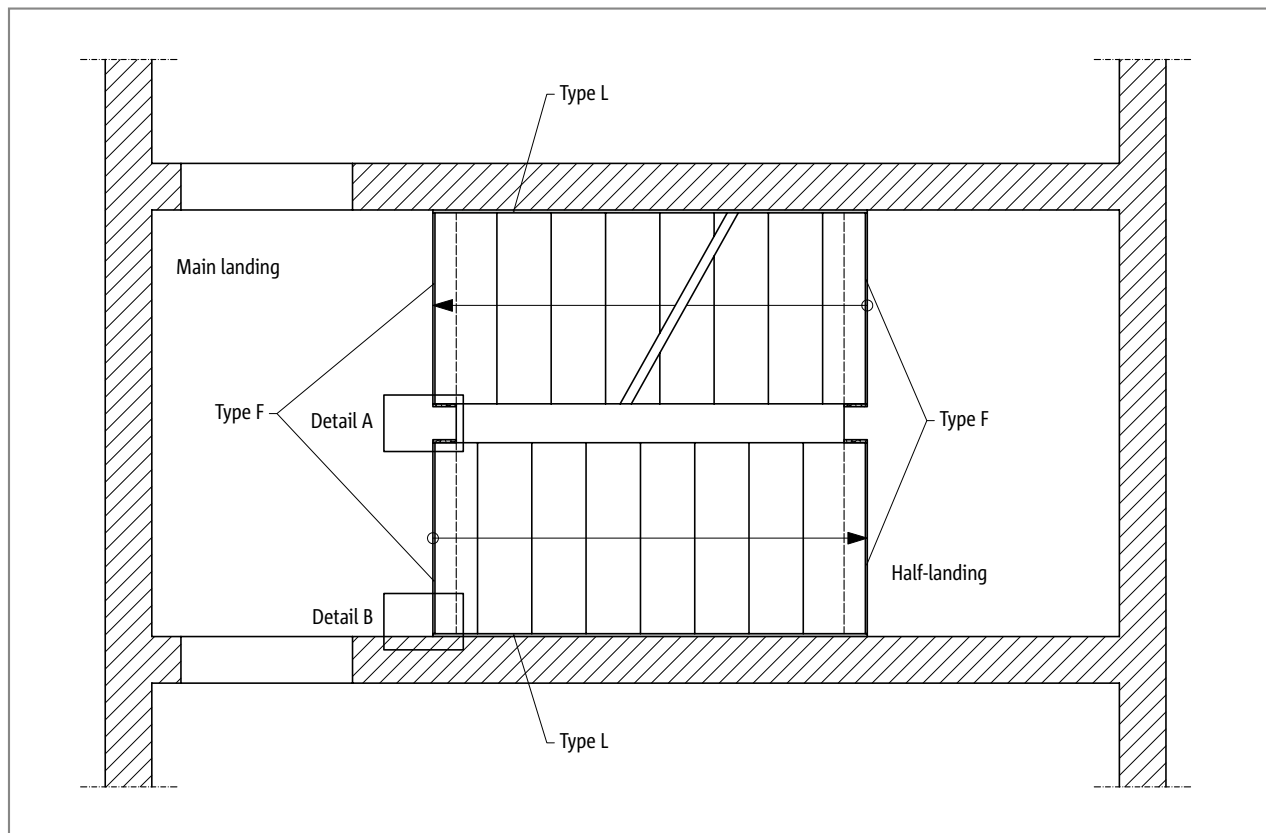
Schöck Tronsole® type F: Element configuration in plan view
